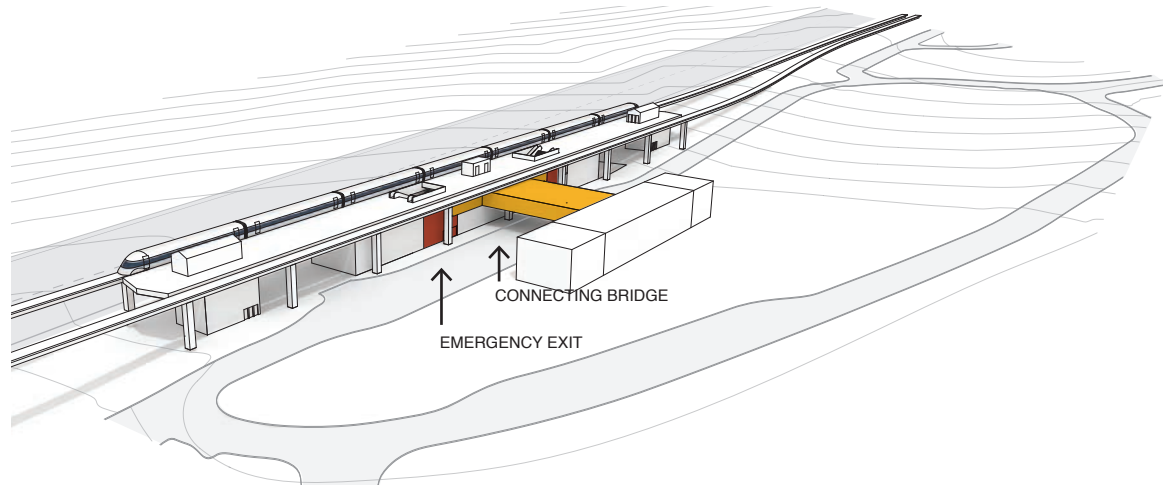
STATION TEMPLATE ADAPTED TO AVON STATION SITE
